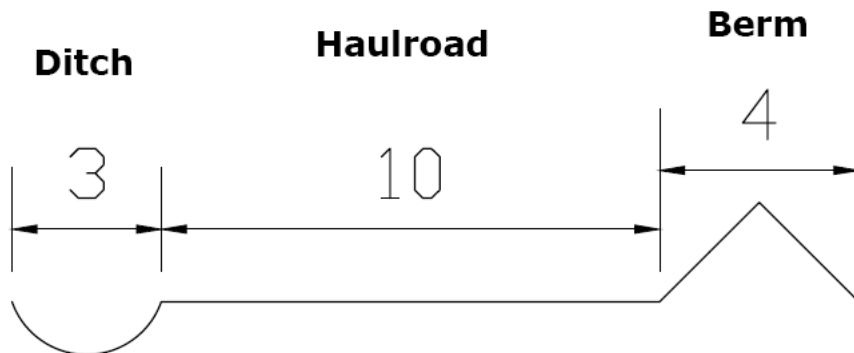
Typical design haul road width for two way traffic in m
